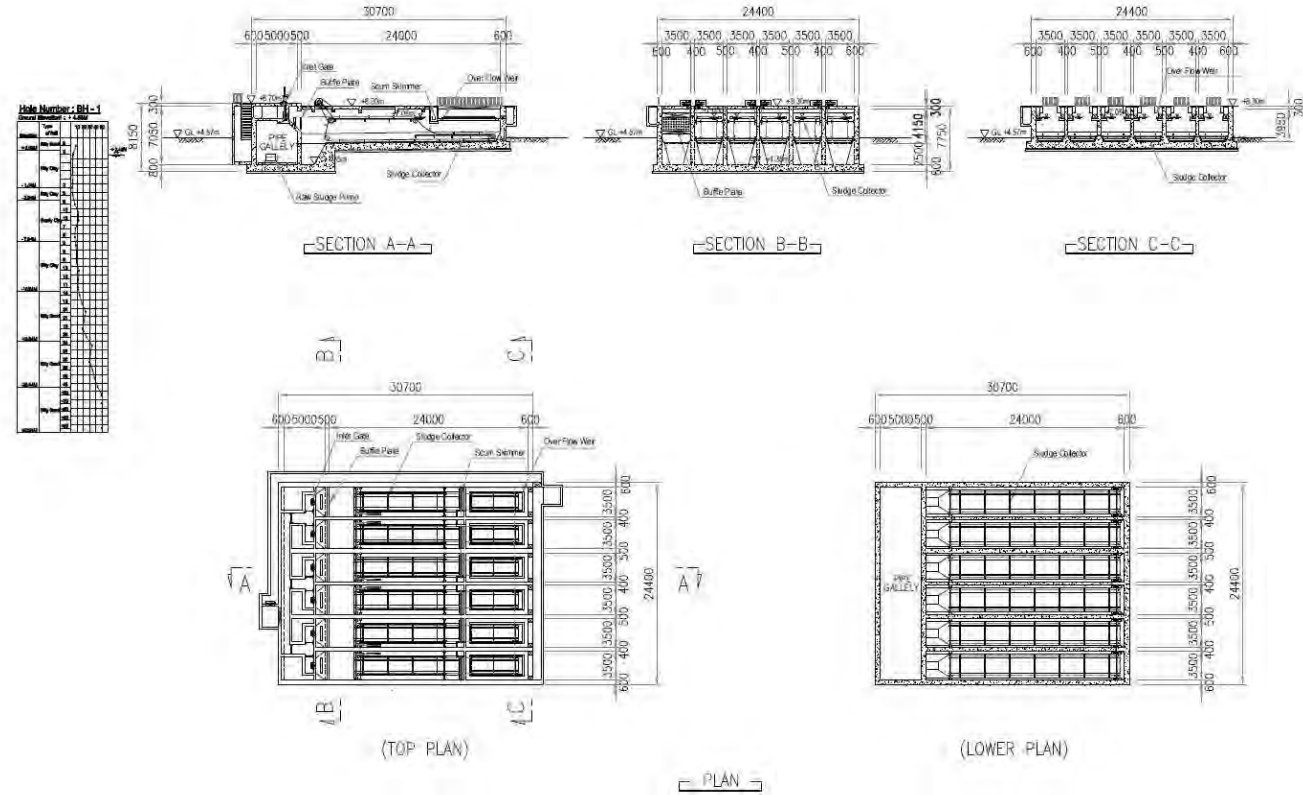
Primary Sedimentation Tank, Plan & Section (New Construction of Existing Line)
